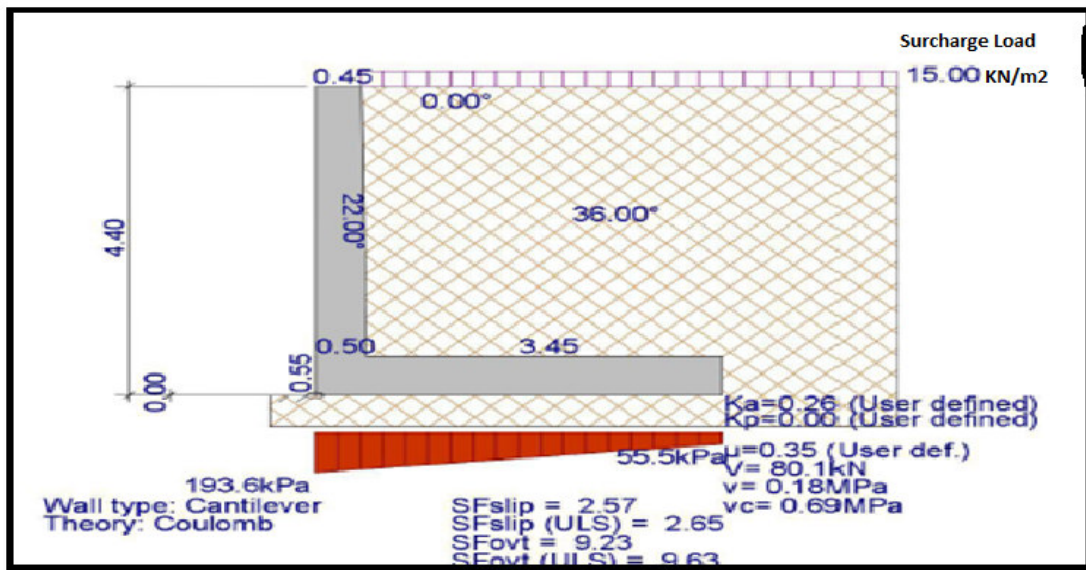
The General Design of the Proposed Reinforced Concrete Retaining Wall Using ProKon Software
